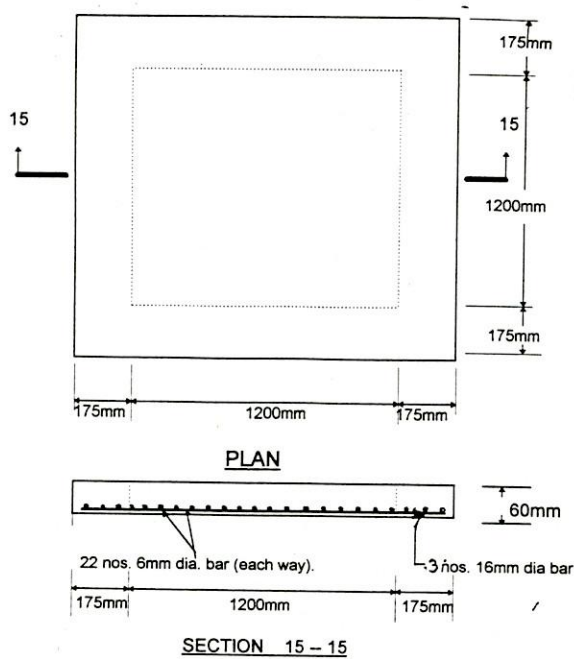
(a) Plan (b) Section and reinforcement details of SLAB15
